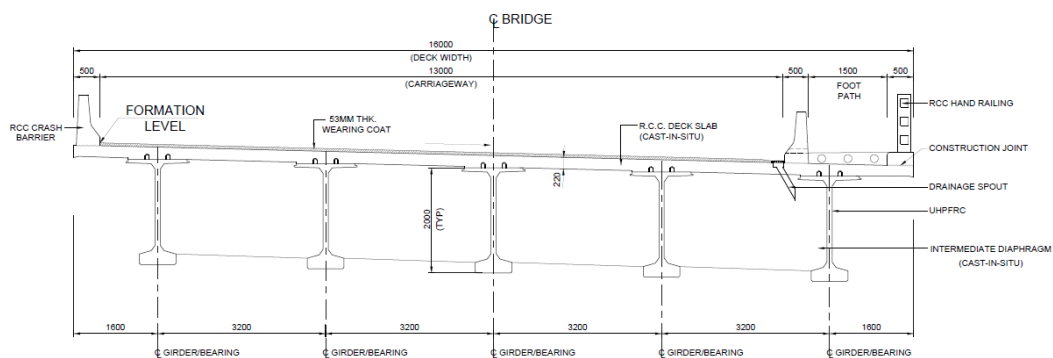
39 Cross section of 45m span UHPFRC post tensioned I girder at mid span
